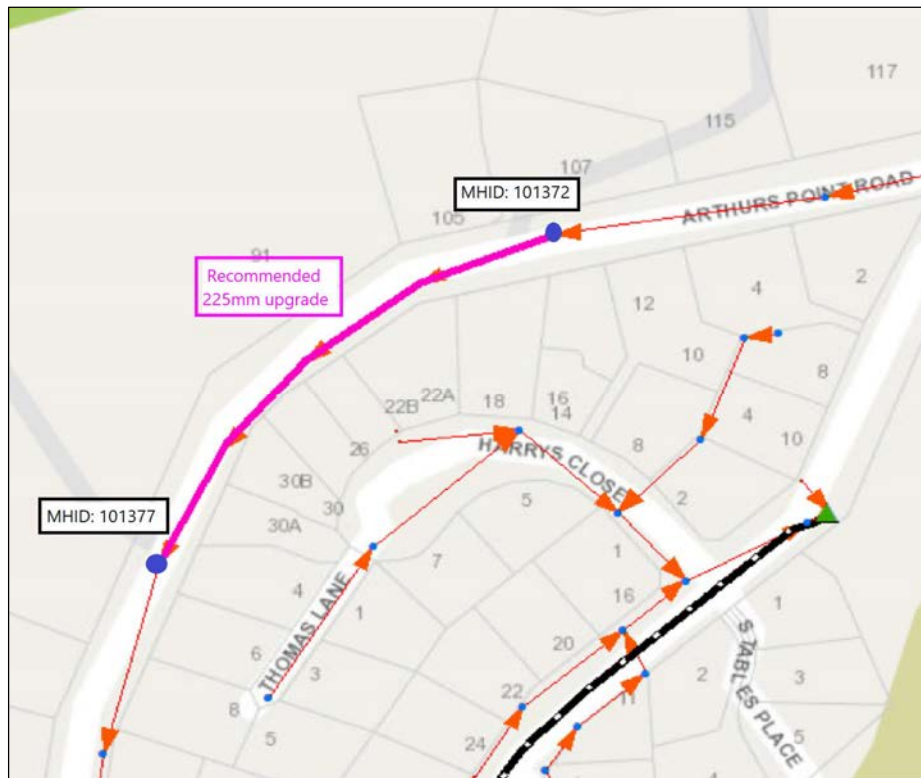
ARTHURS POINT ROAD 225MM UPGRADE (UPSTREAM ATLEY ROAD)
